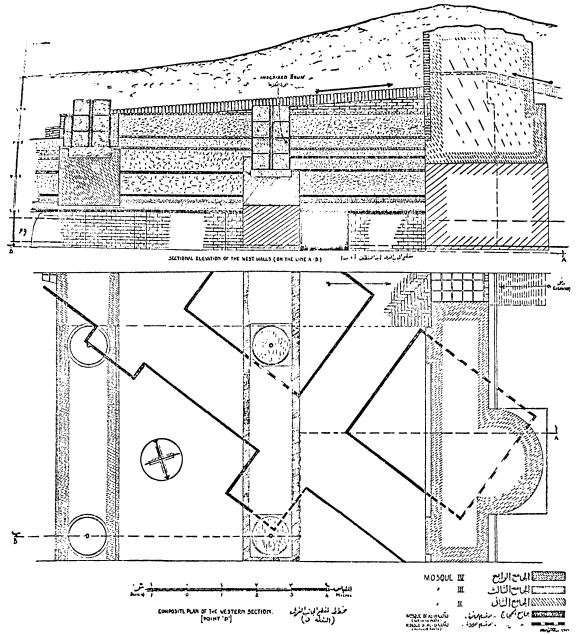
Plan and section of sounding at Point D. Scale 1: 70.
